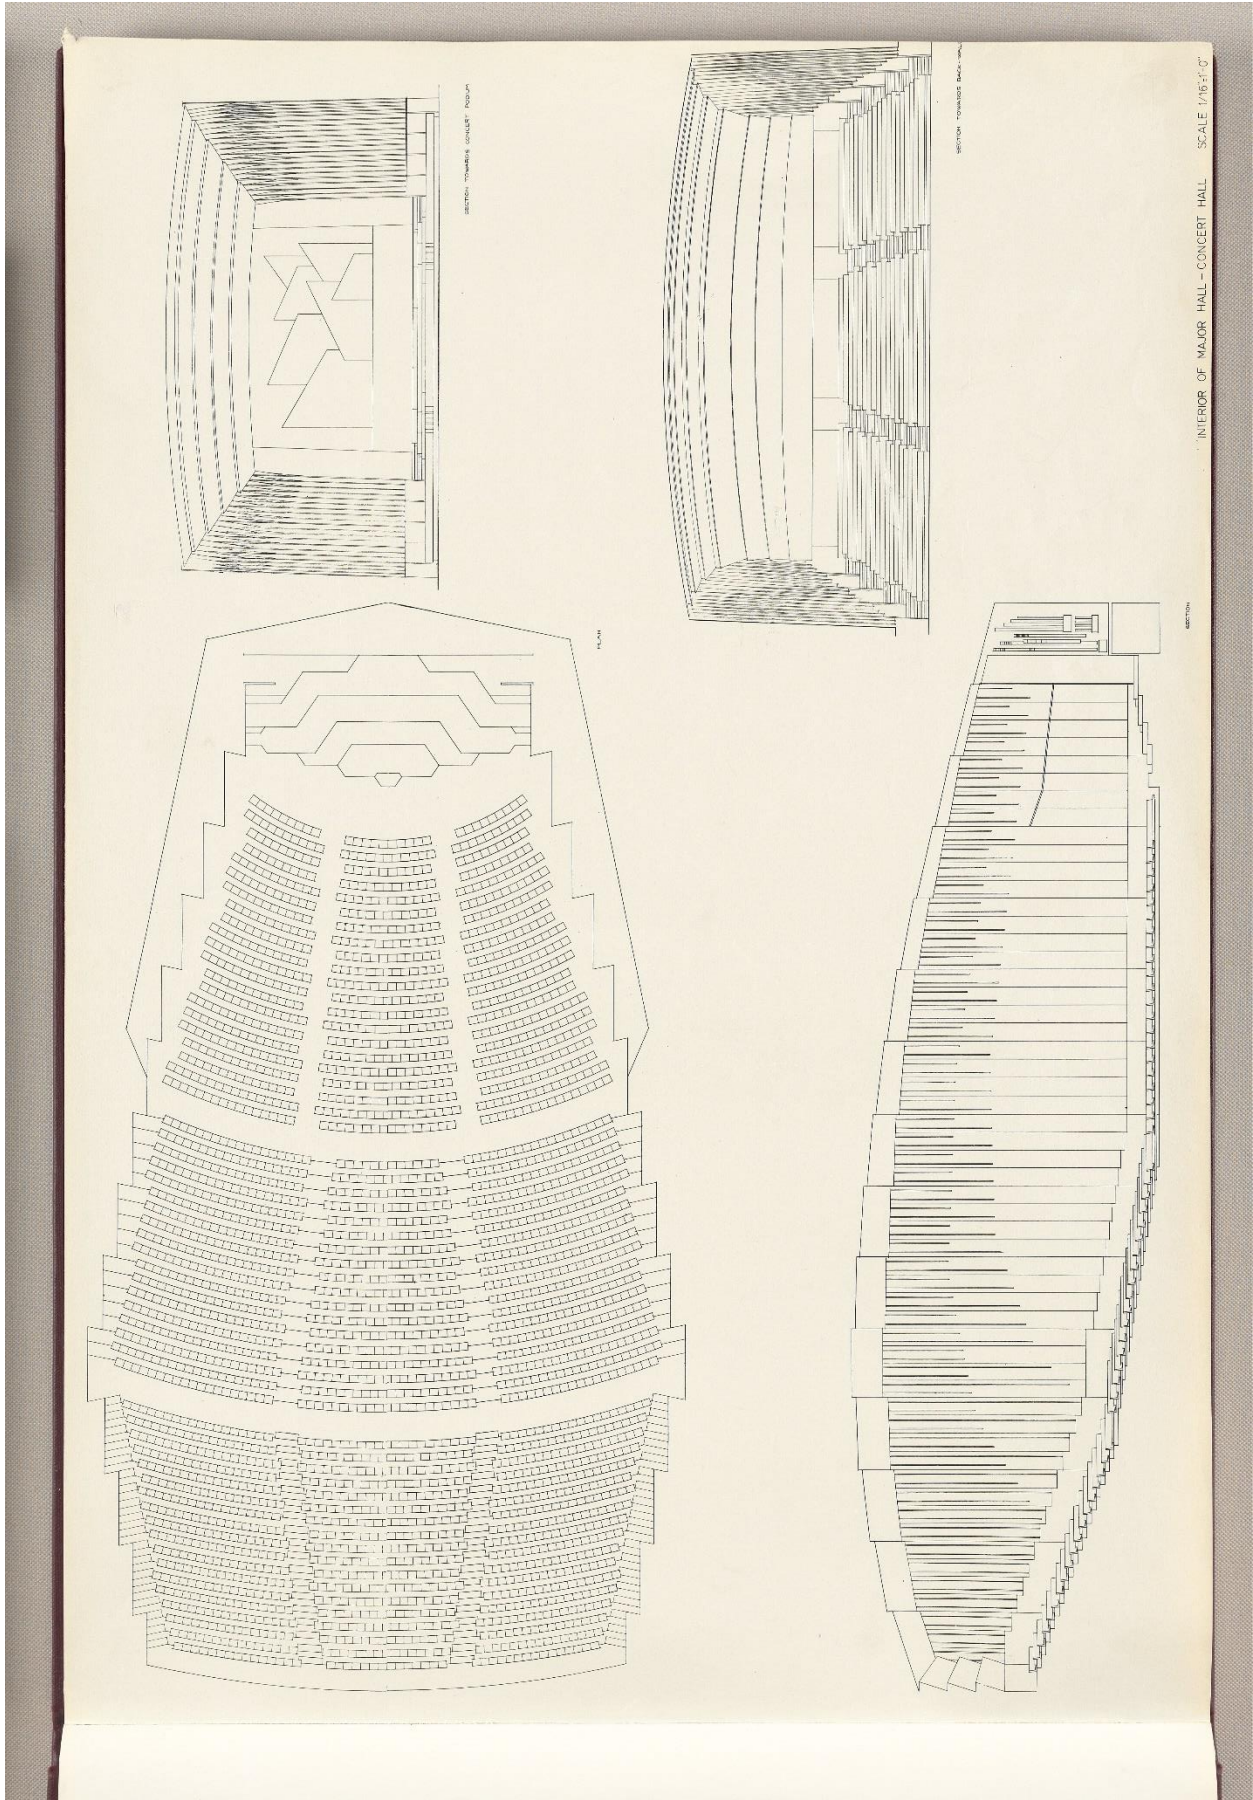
Sydney Opera House – Interior of Major Hall - Concert Hall
